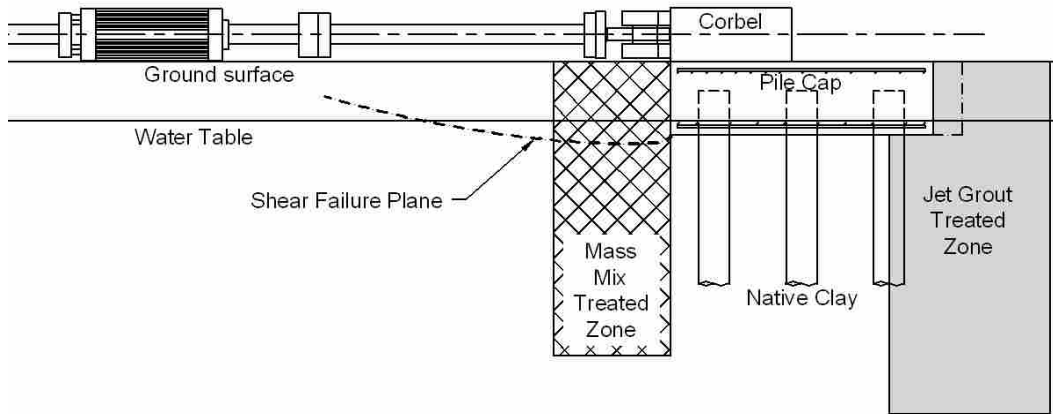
Profile view of a shear failure scenario for the mass mixed soil improvement.
